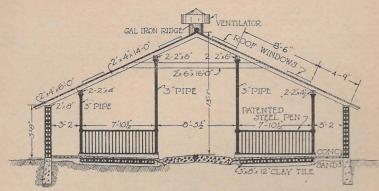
Cross section of hog house No. 10.72-50, showing steel pen equipment, floor and pen construction.
